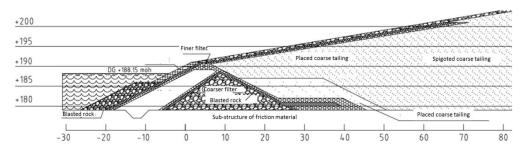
Cross section of dam embankment in-between the TMF and clarification pond.
